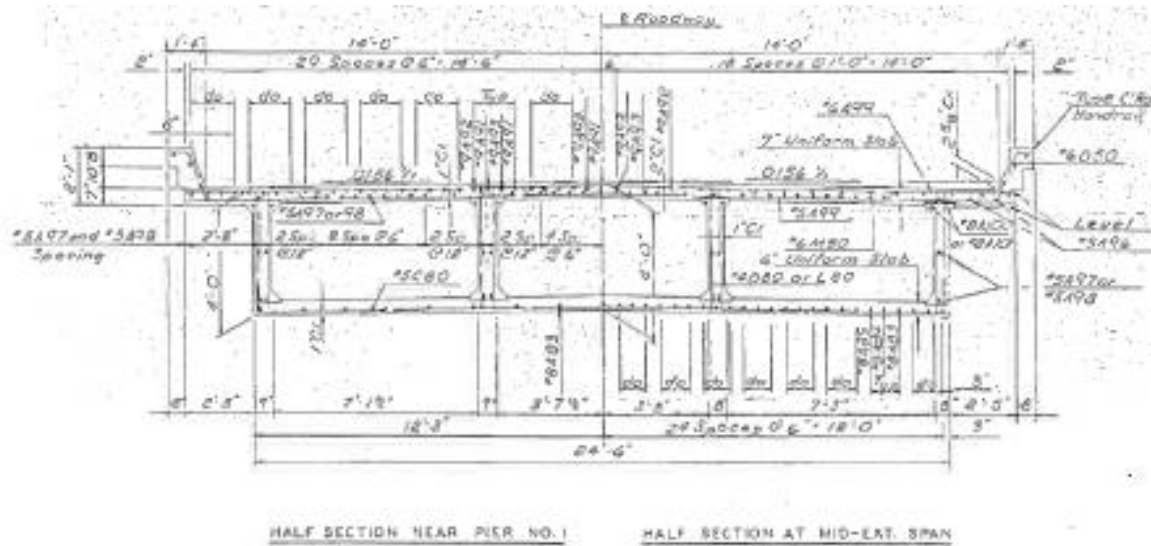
Cross Section of Box Girder, Courtesy of KDOT Bureau of Structural and Geotechnical Services
